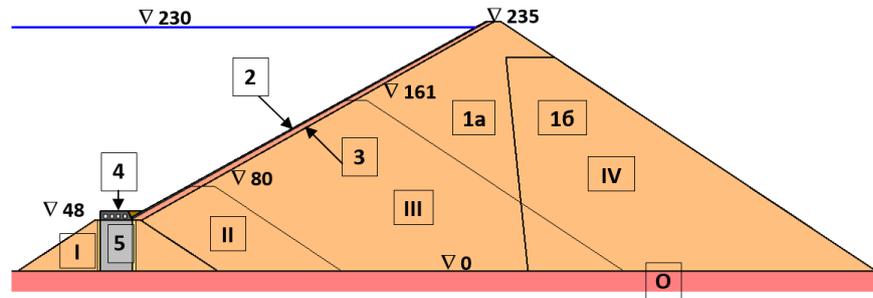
Dam design with combination of seepage-control elements: a concrete face and a grout curtain.
